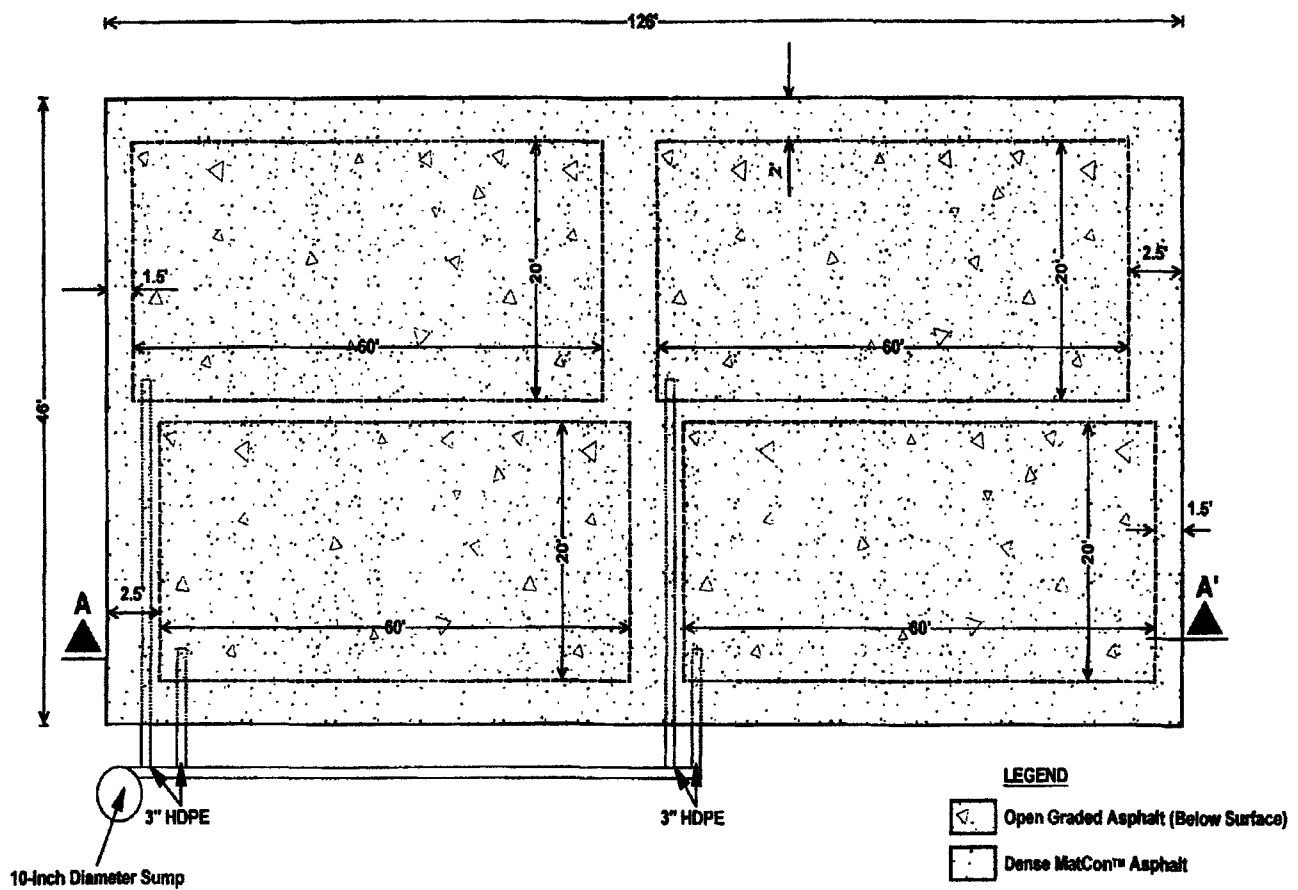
Plan view of Section 1 of the evaluation cover system at Dover Air Force Base.
